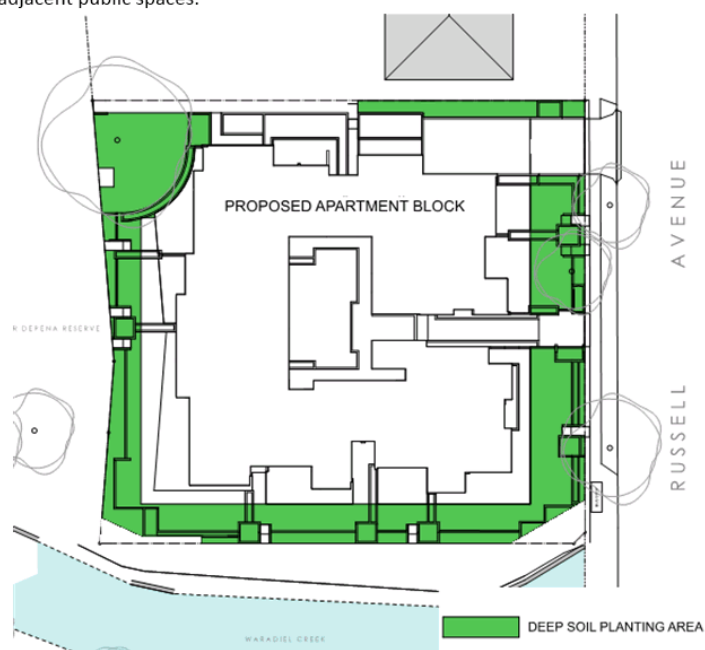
Site plan illustrating quantum and indicative location of deep soil zones.
